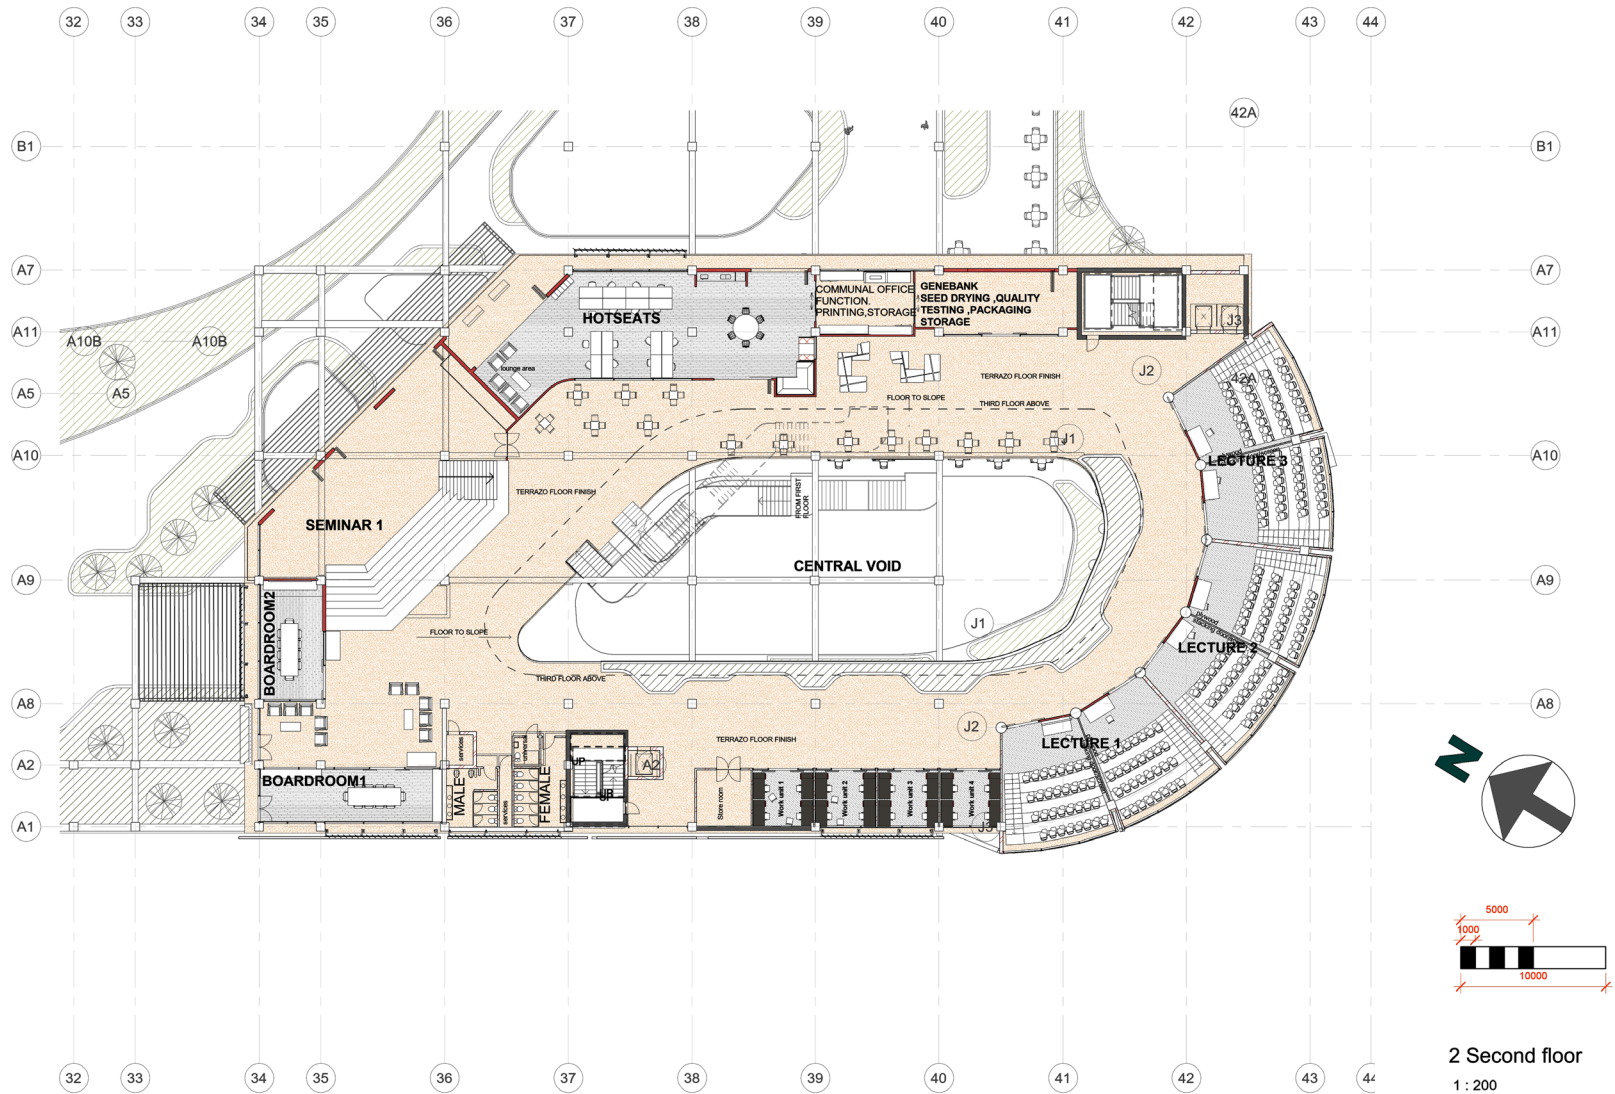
SEMINAR ROOM SECOND FLOOR (AUTHOR 2021)
